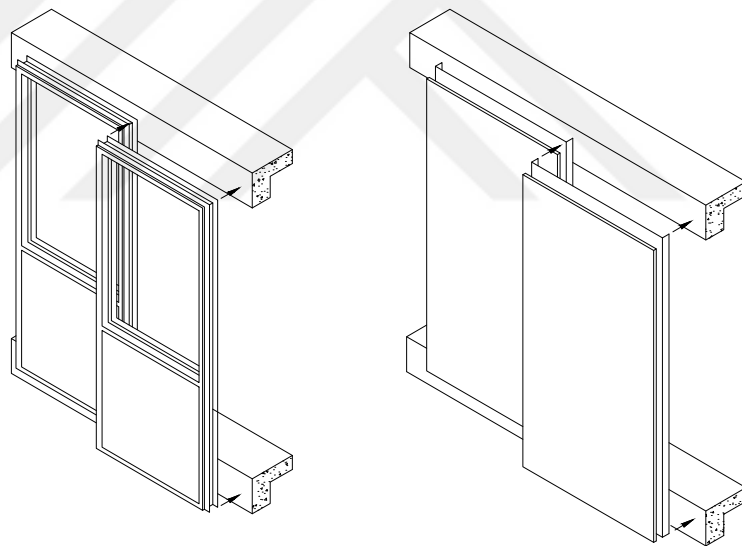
Unit system example, *left* (adopted from Staib et al., 2013), Panel system example, *right* (adopted from Nashed, 1998)
